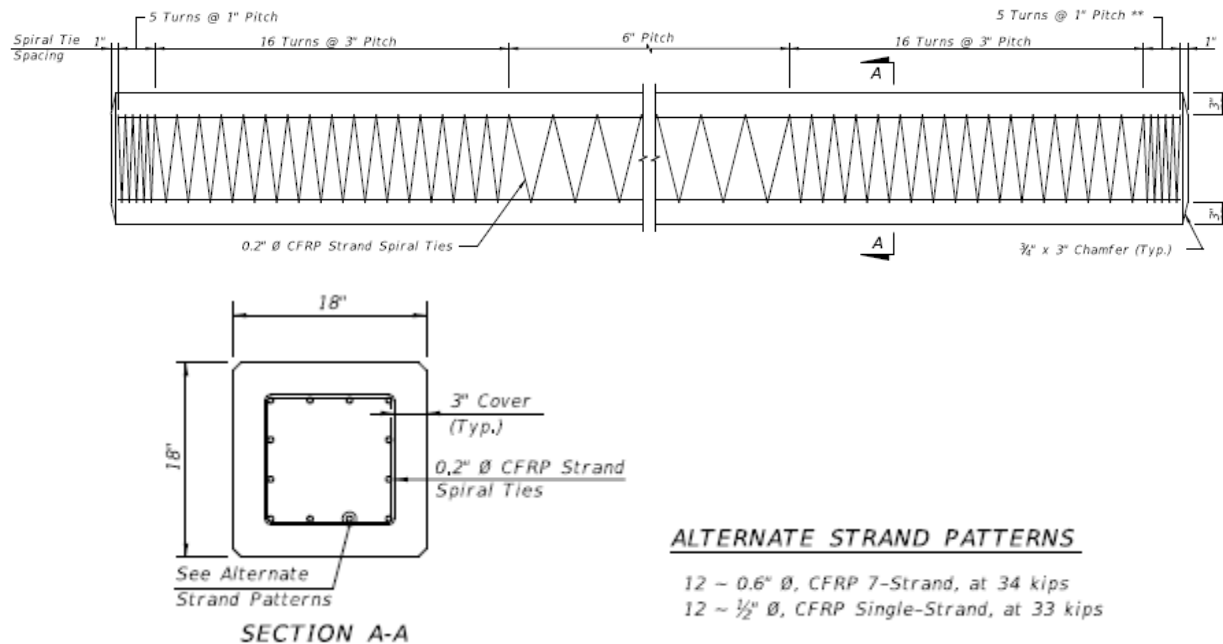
Details of prestressed concrete pile using CFRP strands and ties (FDOT Standard Drawings Index Series 455, 2018)
